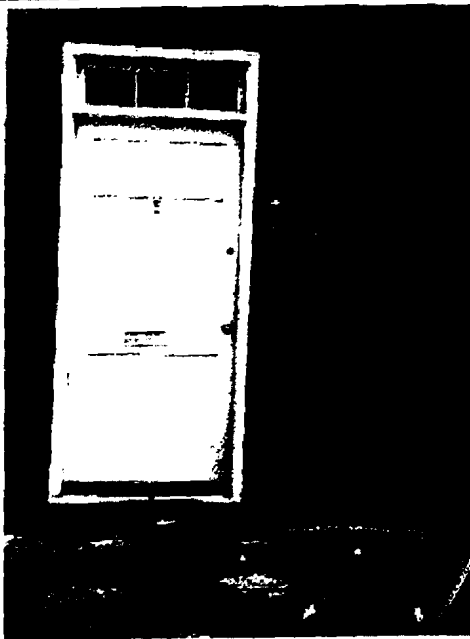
Undated photograph of the front door of 323 N. Saint Asaph Street.
